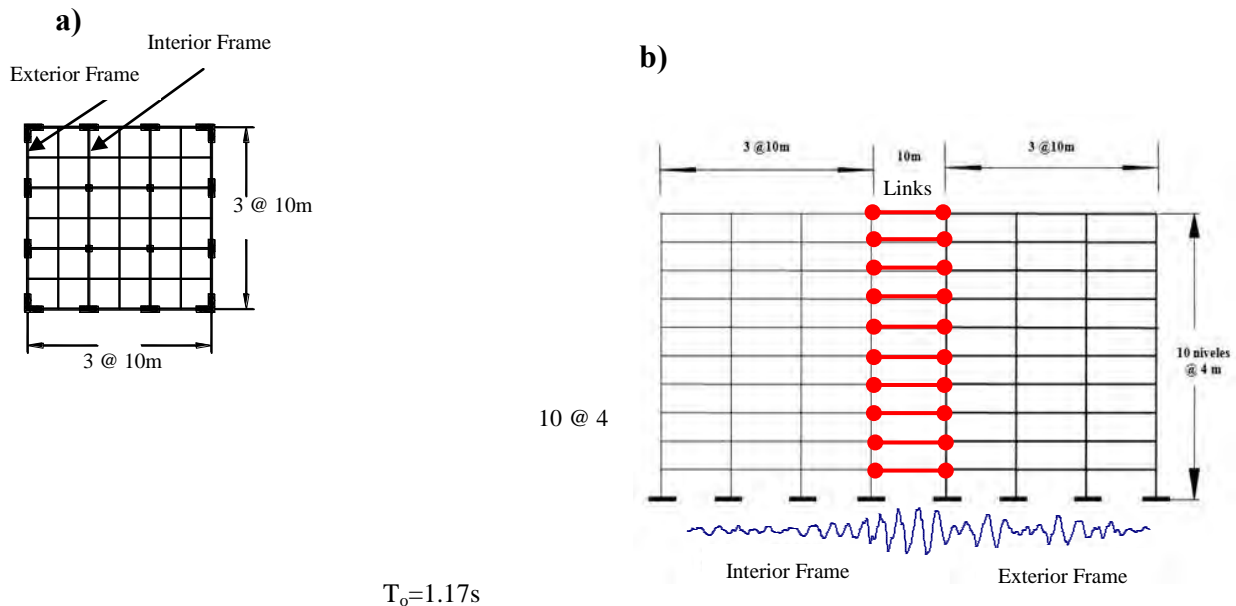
a) Original building plan and elevation and b) two-dimensional model used for non-linear analysis.
